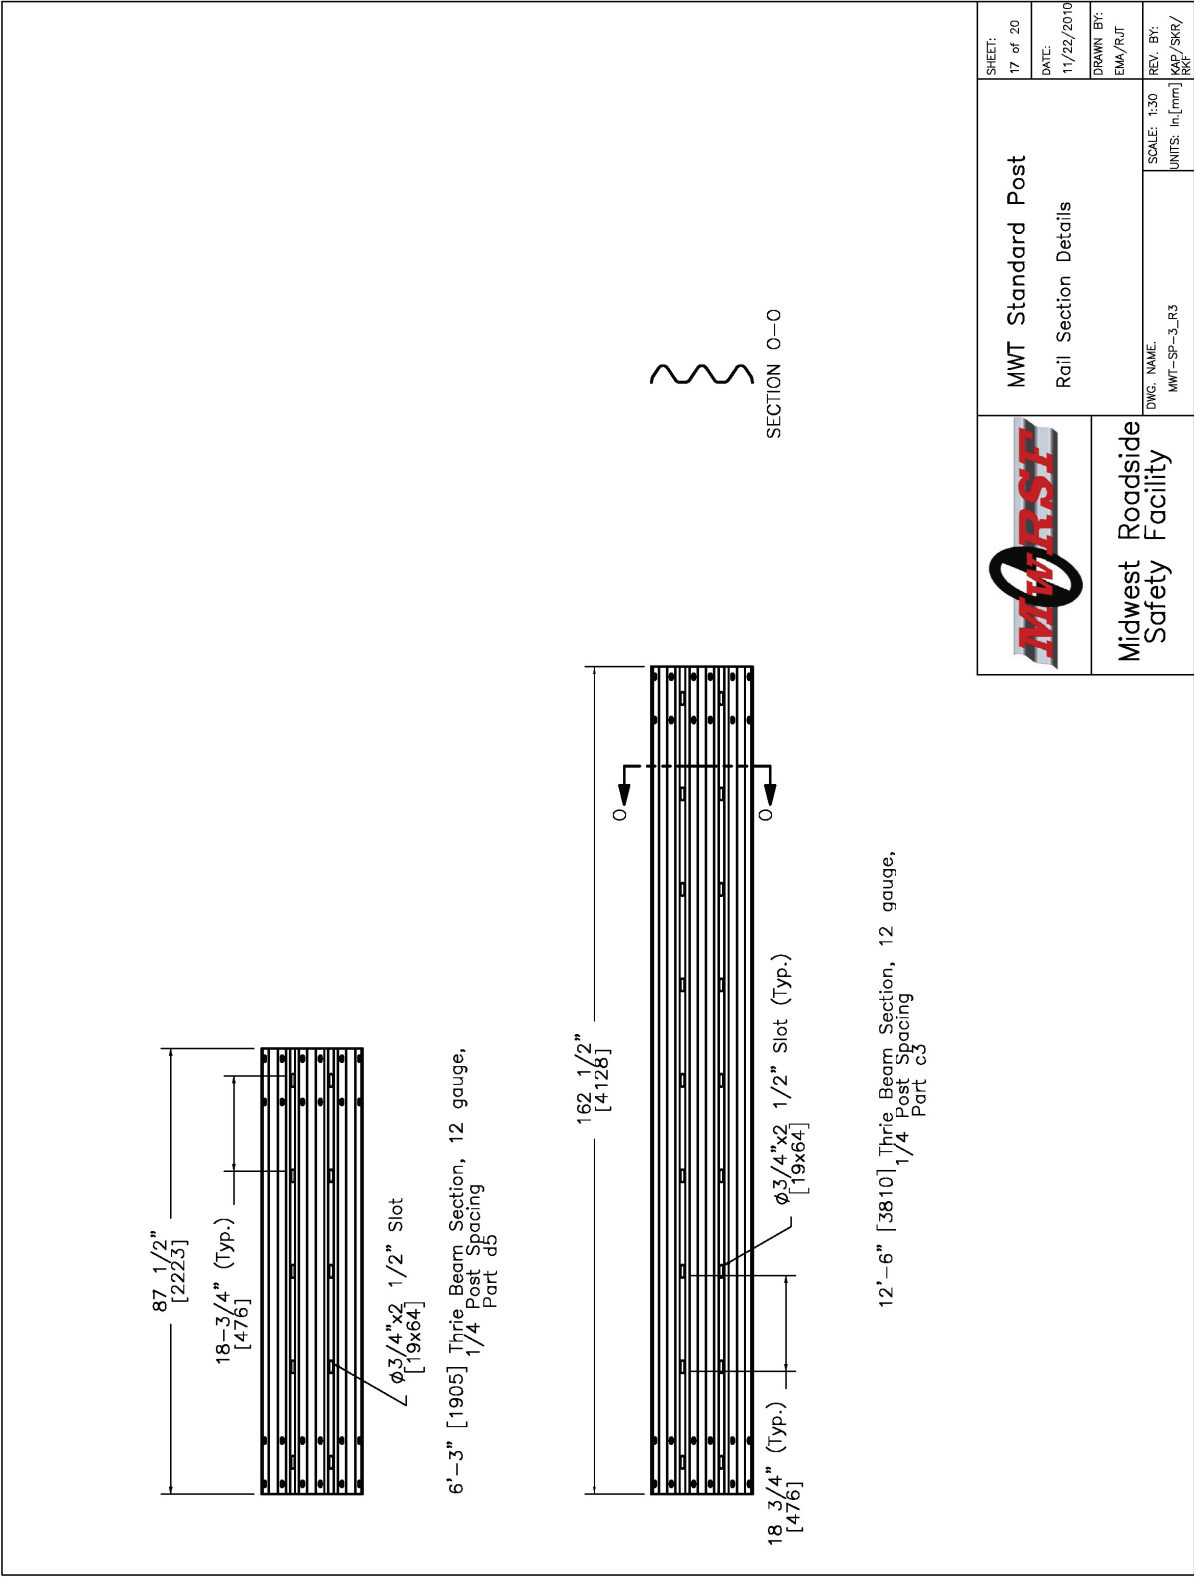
Thrie Beam Rail Section Details, Test Nos. MWTSP-1 through 3
